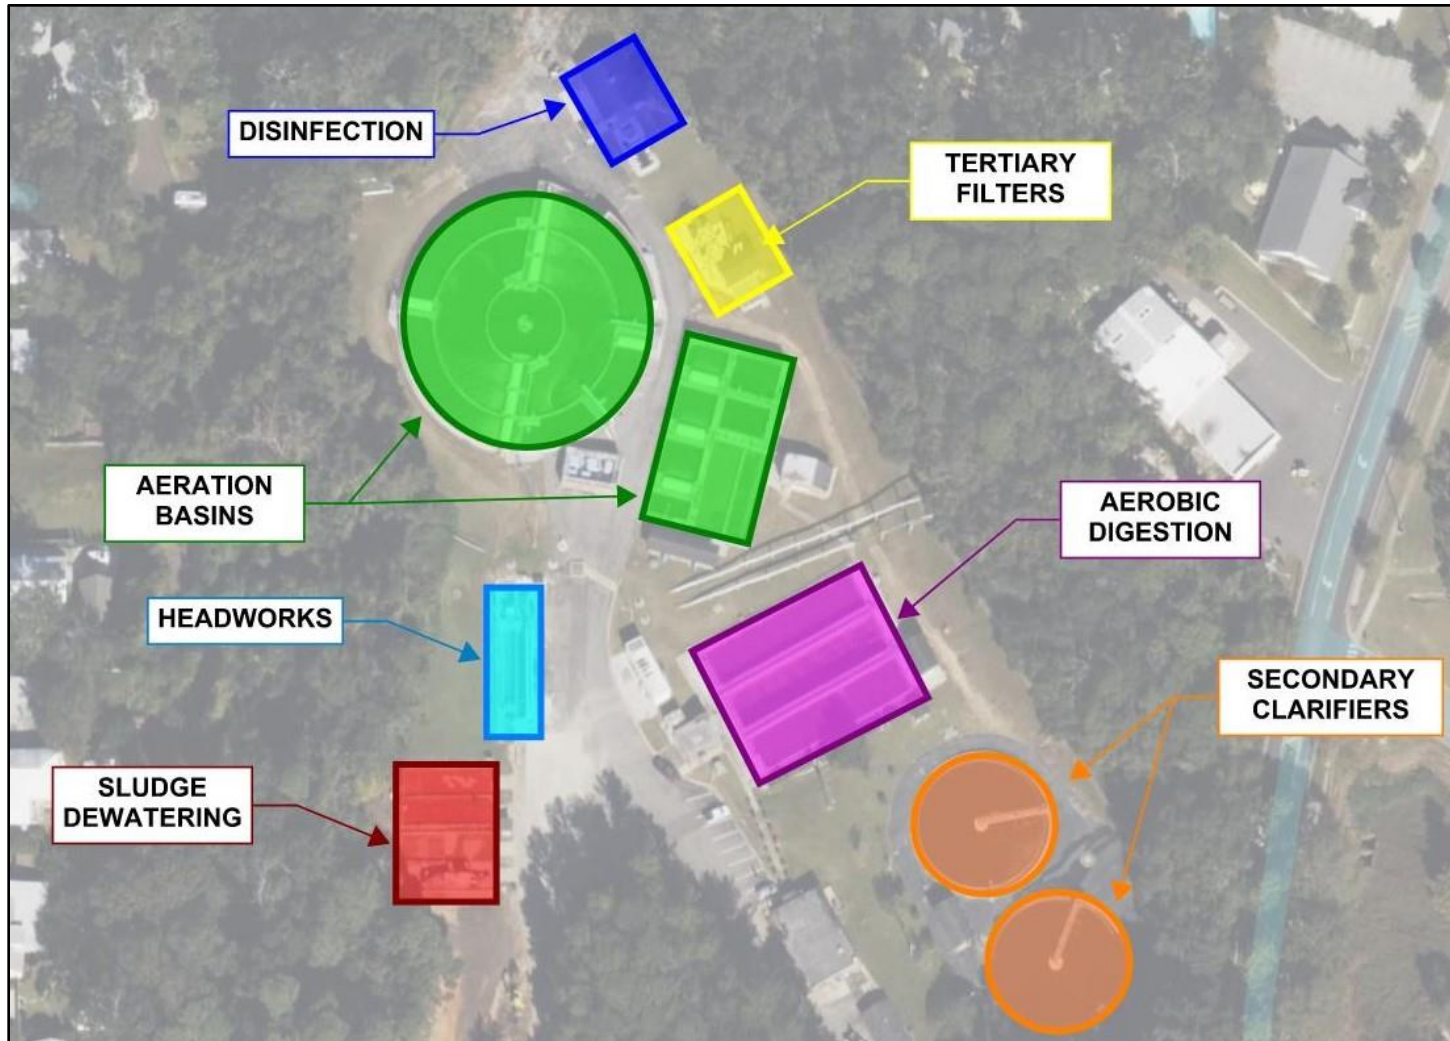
Existing WWTP General Site Plan and Major Unit Process Layout
